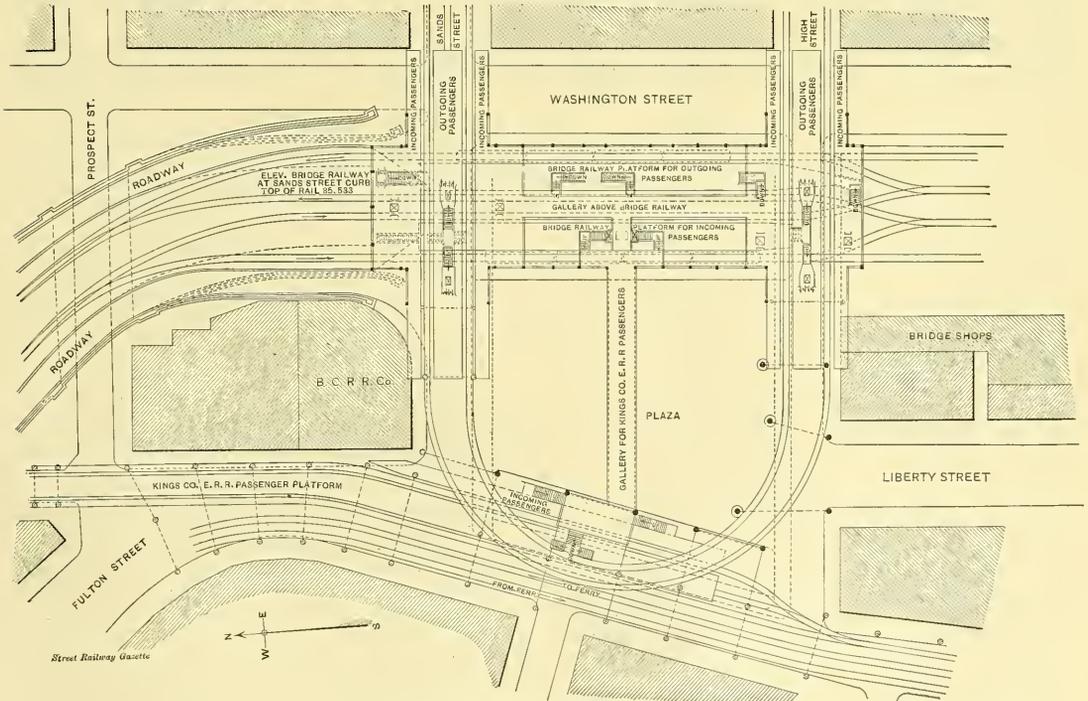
GENERAL PLAN OF TERMINAL BUILDING.
